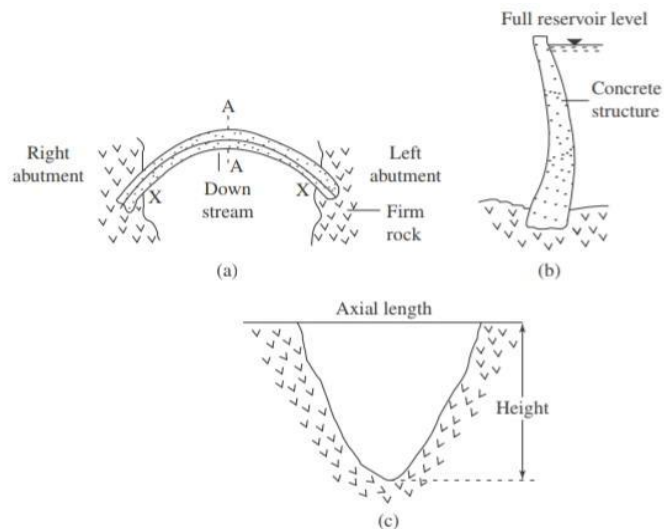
Arch gravity dam: (a) plan view; (b) cross section across the arch dam (A-A); and (c) cross section along the axis (X-X) of the arch dam
